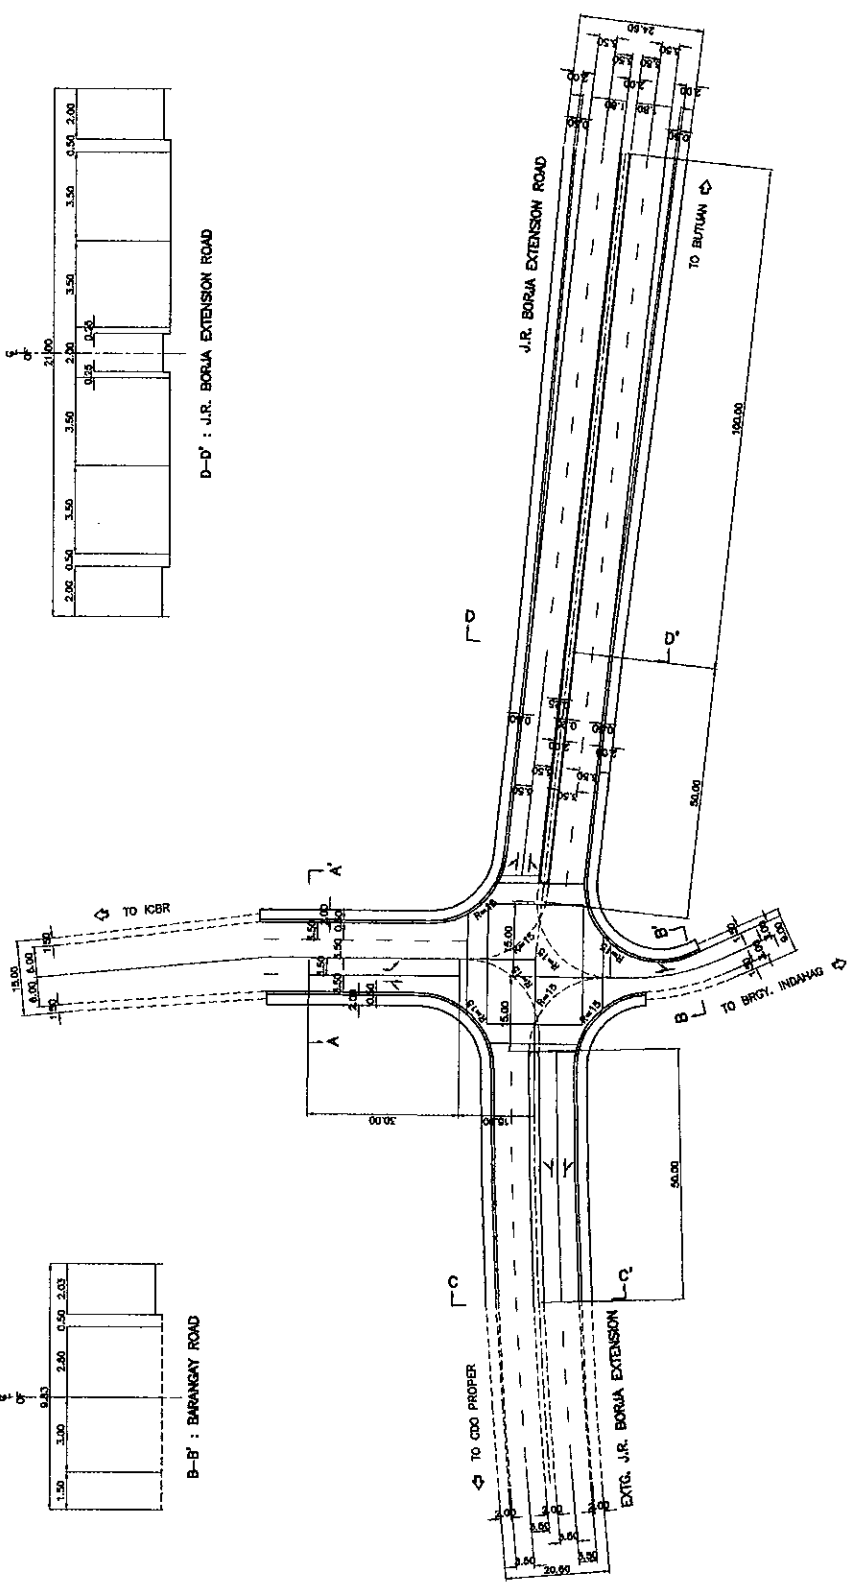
INTERSECTION WITH ICBR ACCESS ROAD
